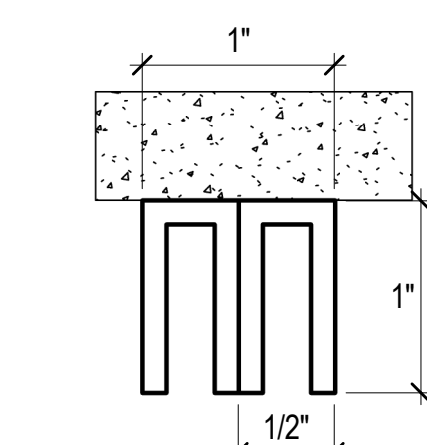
DETAIL - DUGOUT ROOF DRAIN (RD-2)
